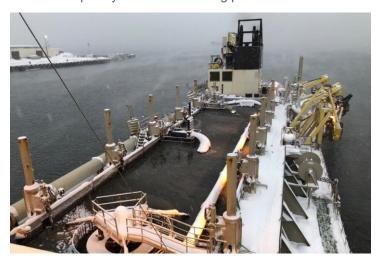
SECOND DREDGING SEASON; ON THE TRAILING SUCTION HOPPER DREDGERS (TSHD) WITH FULL HOPPER, READY TO SAIL TO DAS (DISPOSAL AT SEA) SITE (JANUARY 2020)
